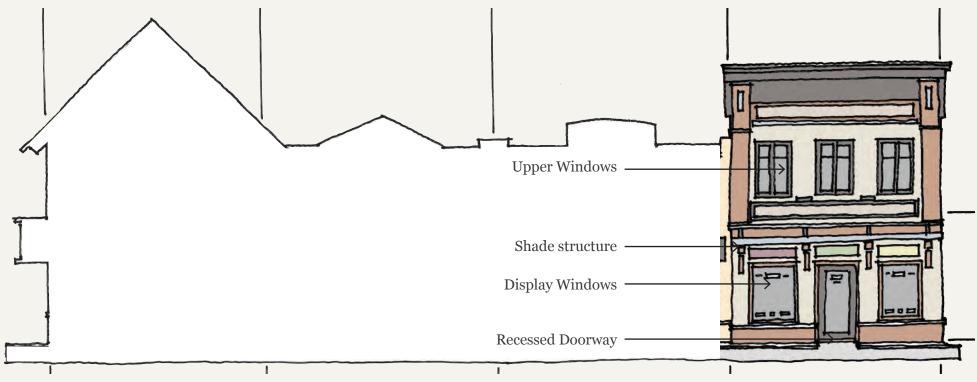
TYPICAL BUILDING ELEVATION - ENTRANCES & WINDOWS
